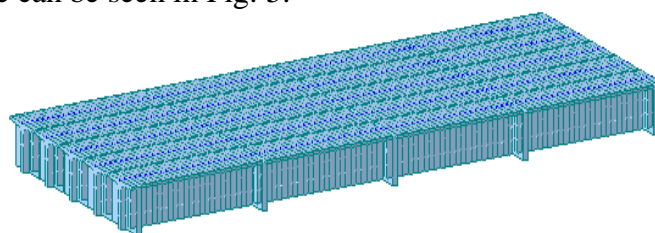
MIDAS model of the Long Tan bridge single-span main beam
